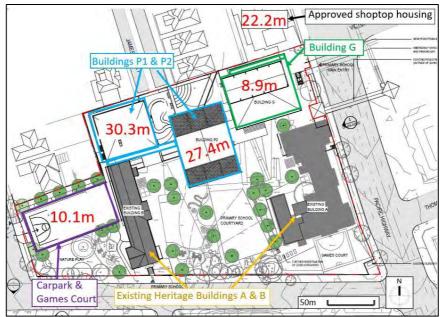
| Site plan showing proposed building heights (Base source: RtS 2020)
